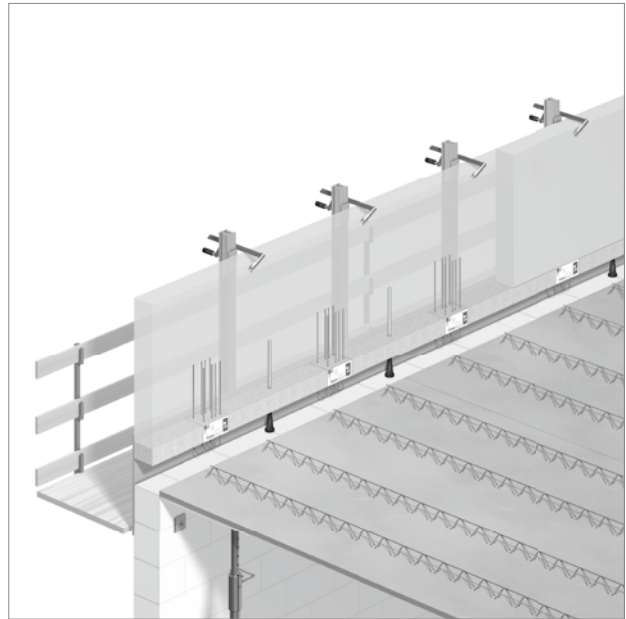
Schöck Isokorb® XT type A with Combar® erection support for precast elements: Securing of the aligned precast concrete parapet
